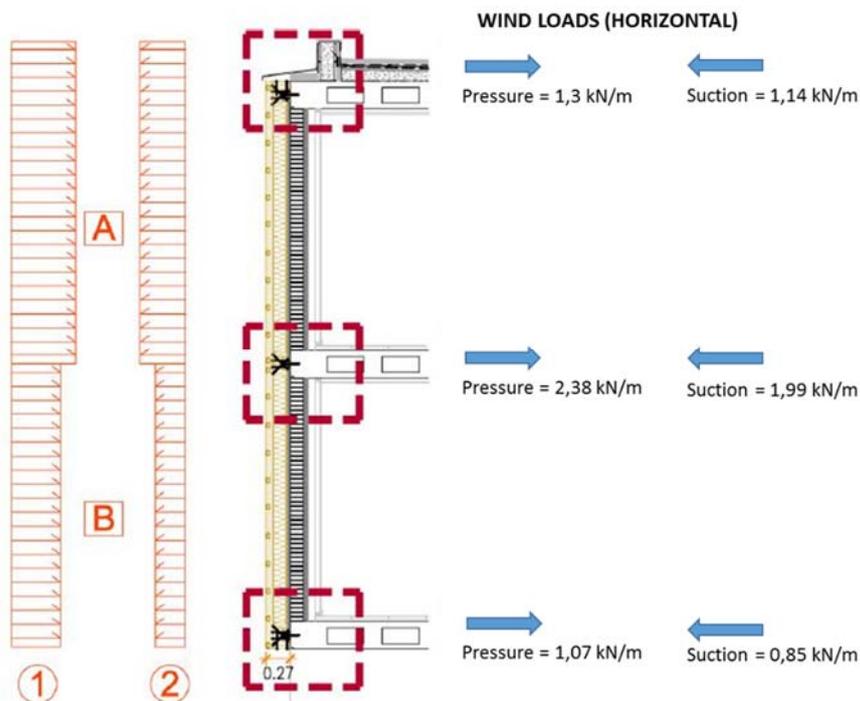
wind loads in the anchoring system of the Prefabricated Multifunctional façade (PMF).
